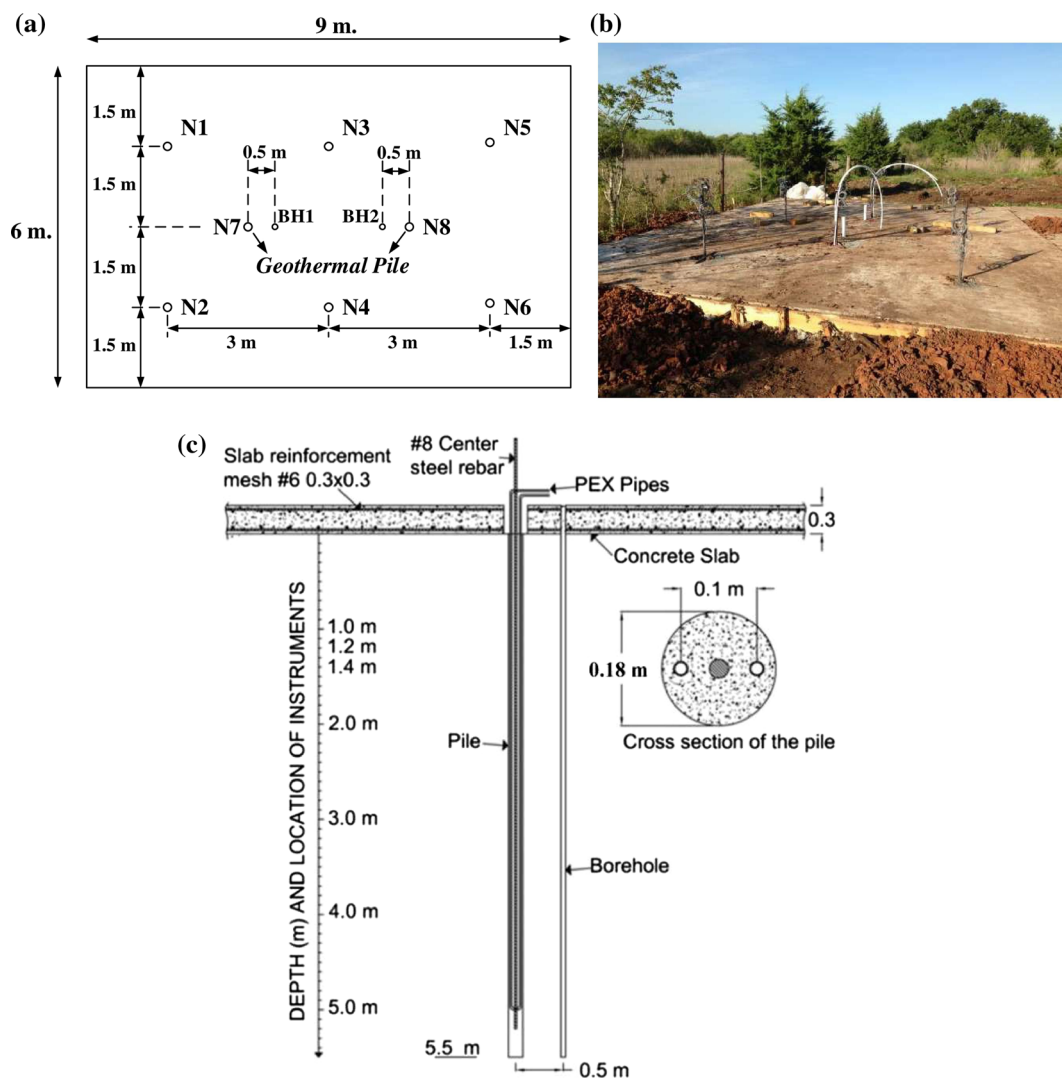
a Pile layout with slab dimensions; b picture of mat; c cross section and plan view of the pile
